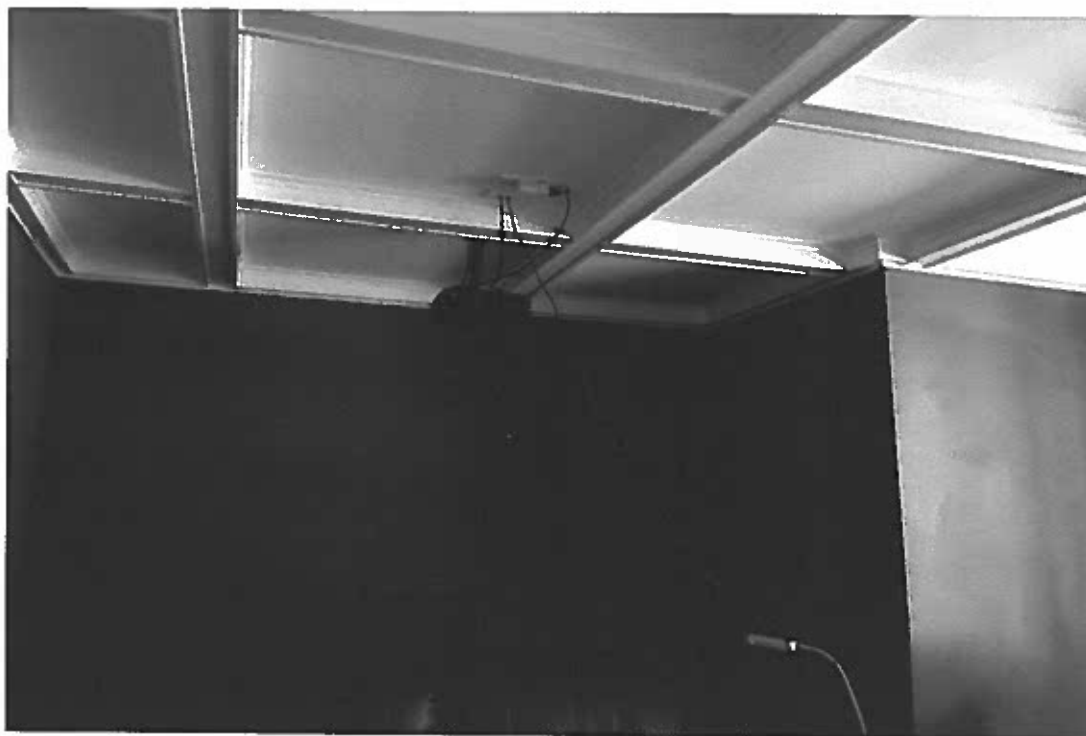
Inside Kitchen facing east. Door to outside is visible at the left side.
